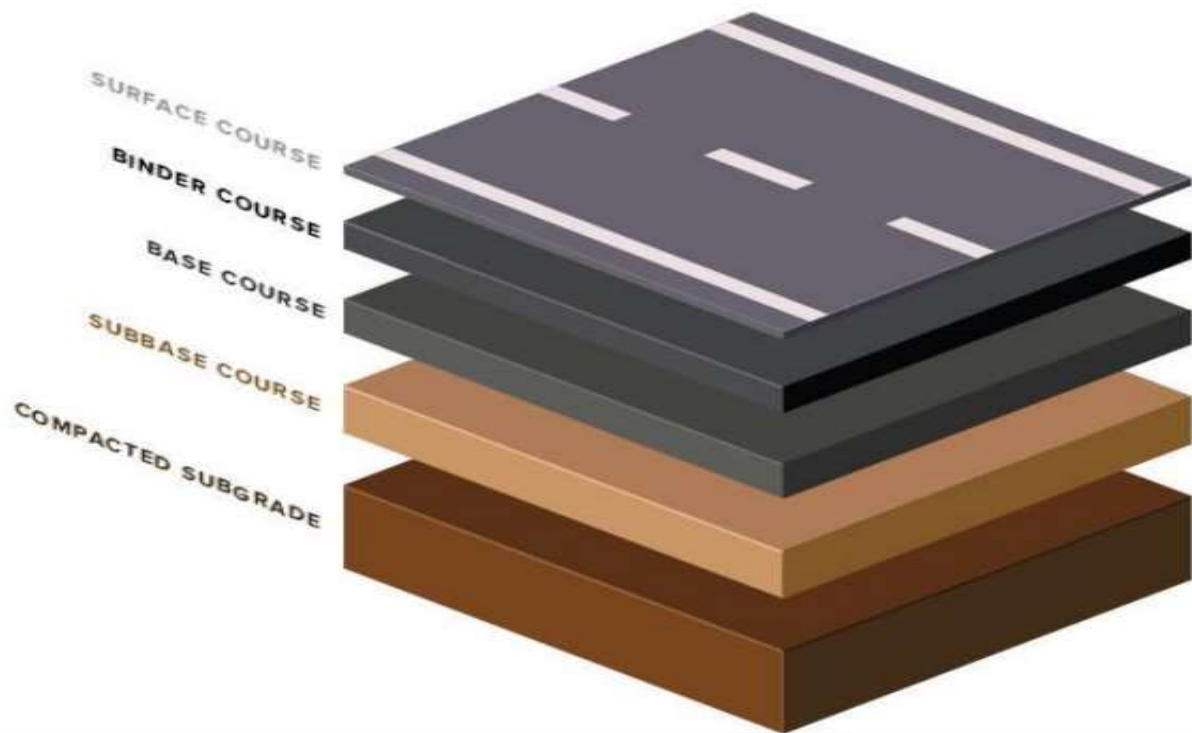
Vertical section of asphalt concrete pavement structure (Source: Google)
